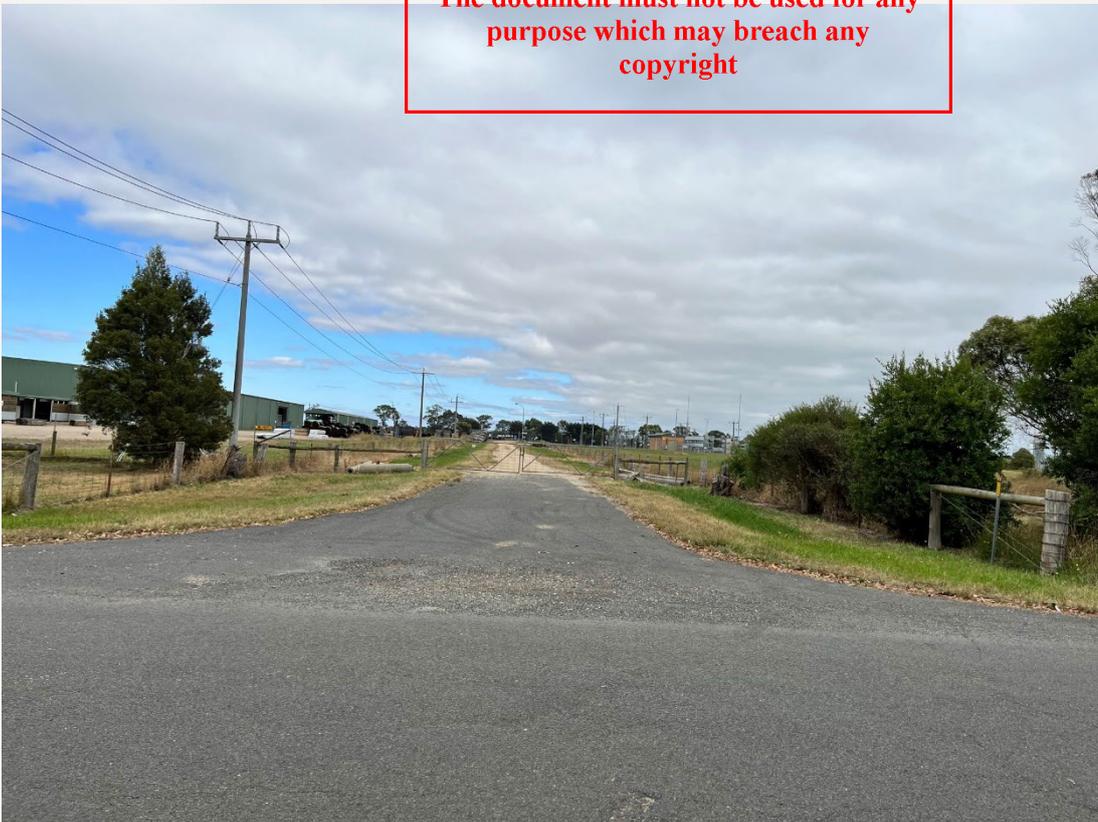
| View of entry to 25 Power Station Road, viewed from Power Station Road, looking west
